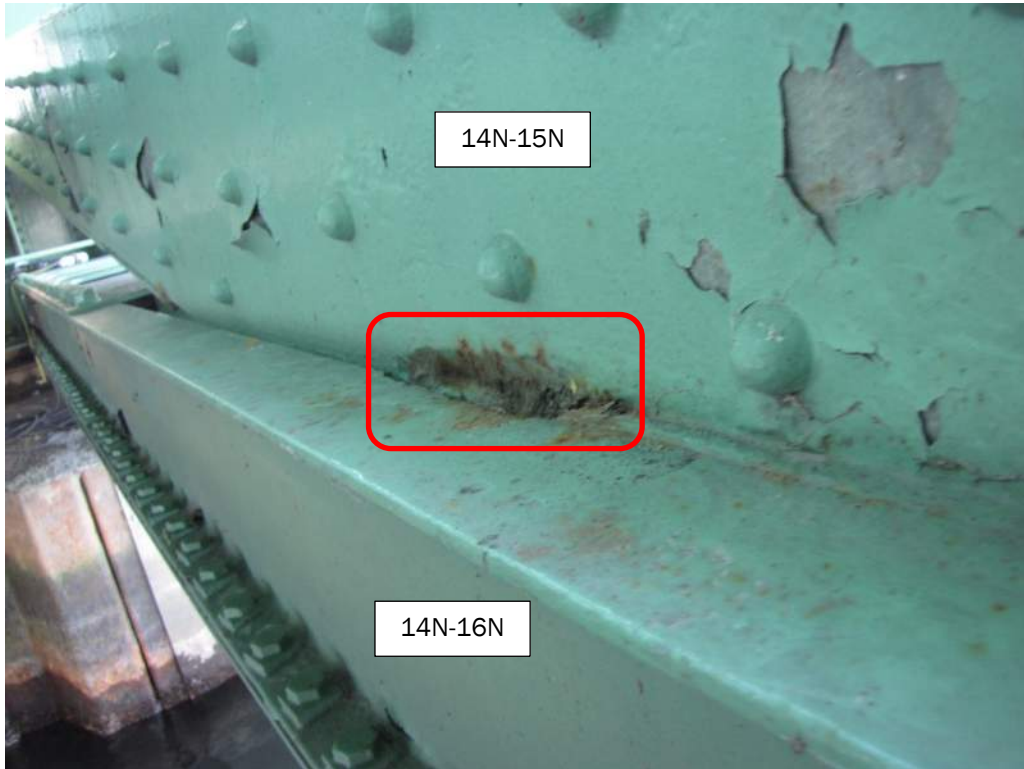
Moderate to severe pitting and minor rust jacking between member 14N-15N and 14N-16N.
